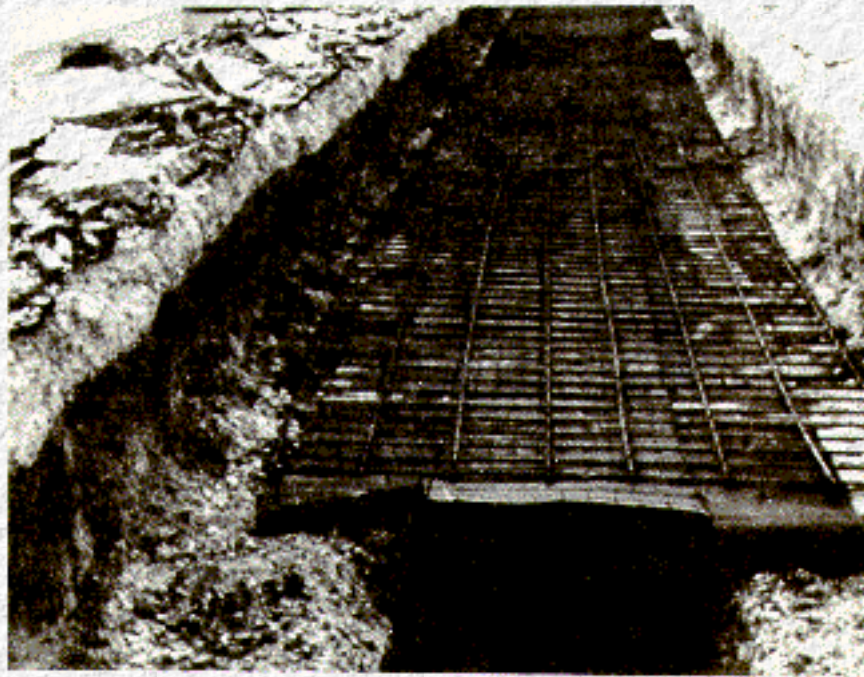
Excavation for Slab-Covered Trench. (*Caltrans Photo, Miami Area*)
